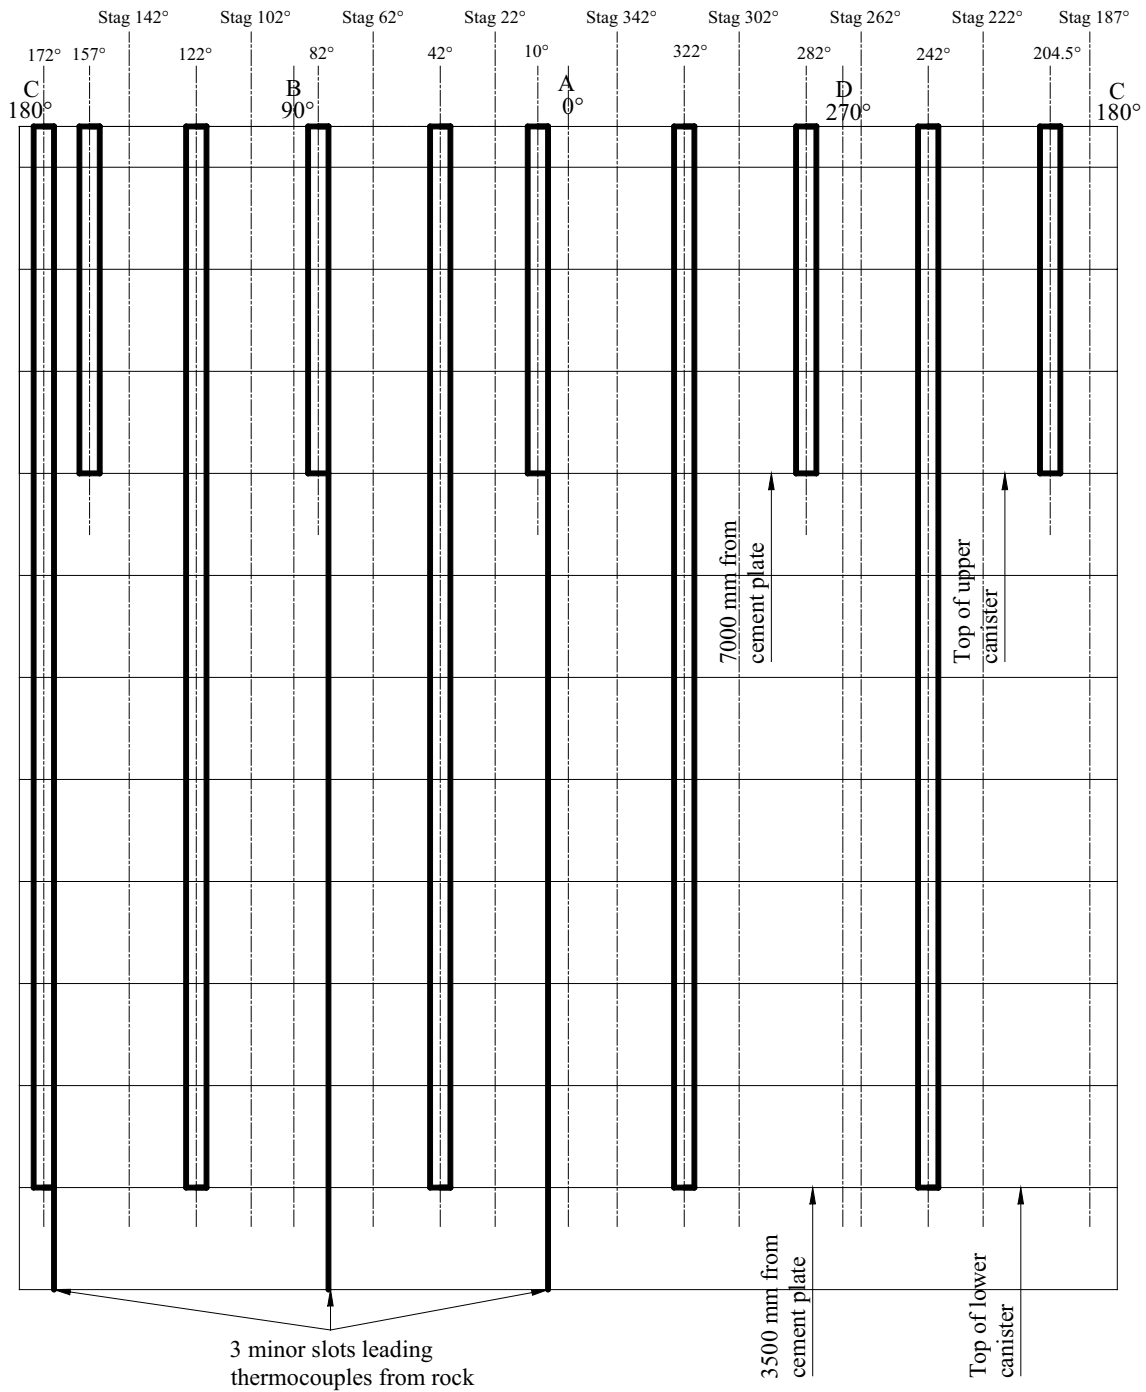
Schematic view, showing the inner surface of the deposition hole.
